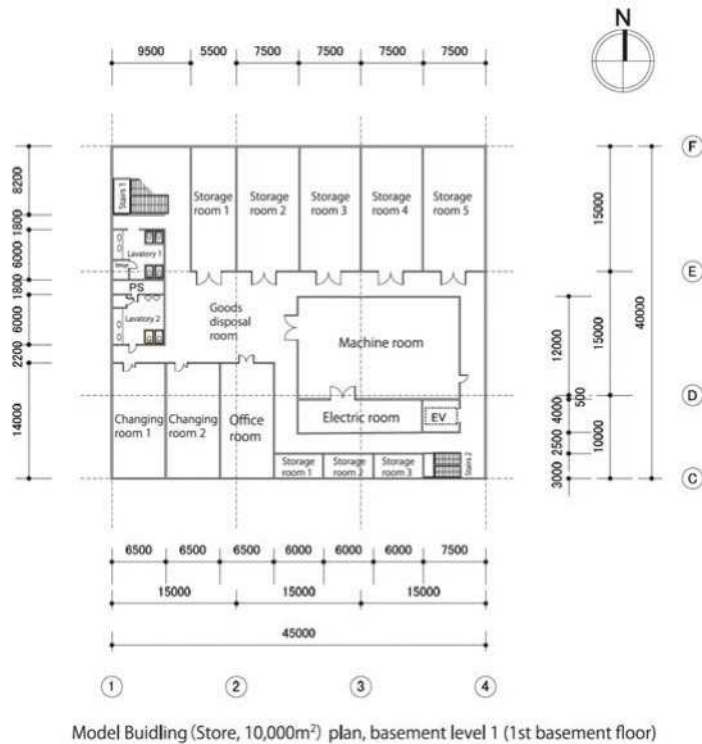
Model building (store, 10 000 m²) plan, basement level 1 (first basement floor)
